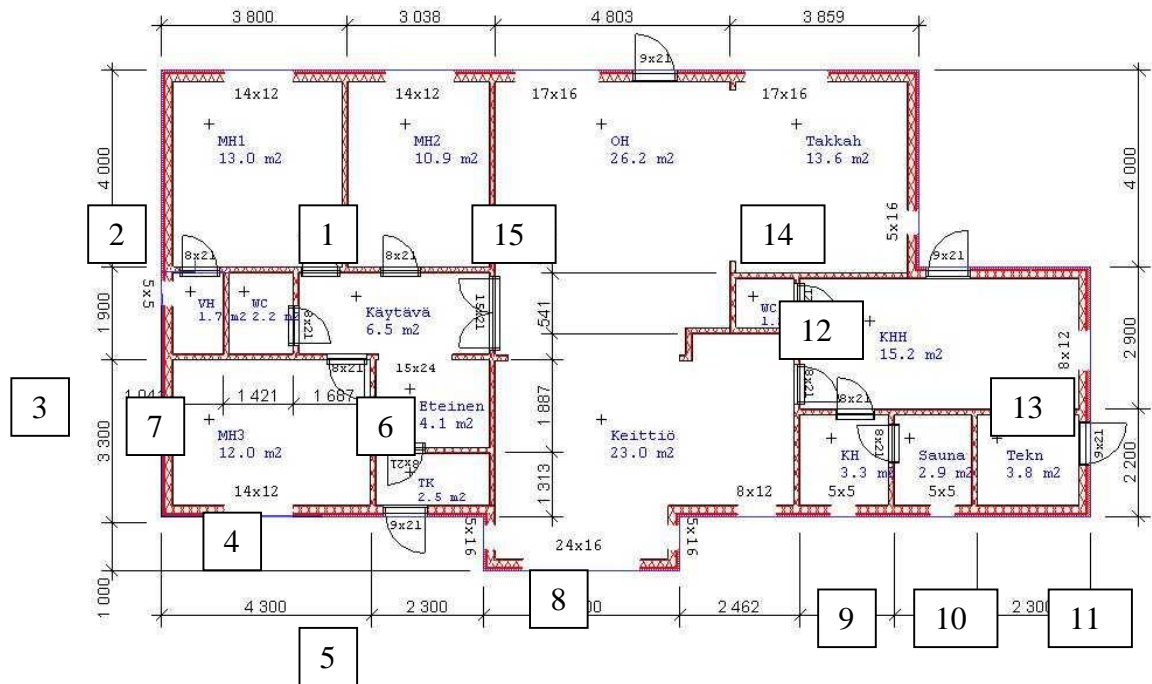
The ground plan of the type house used in simulations and numbering of the rooms.
